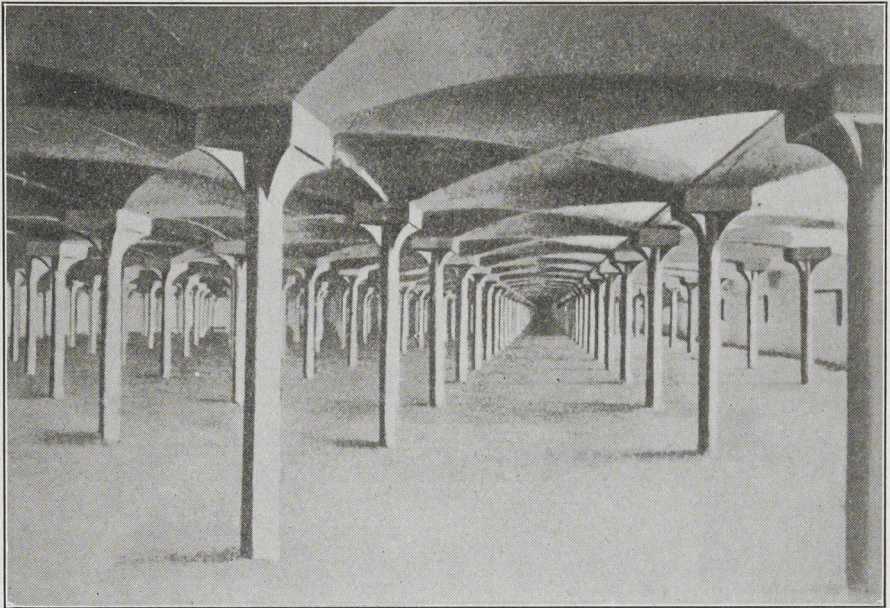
Germinating floor in a brewery in Dublin, Ireland, showing barley spread out to germinate.
